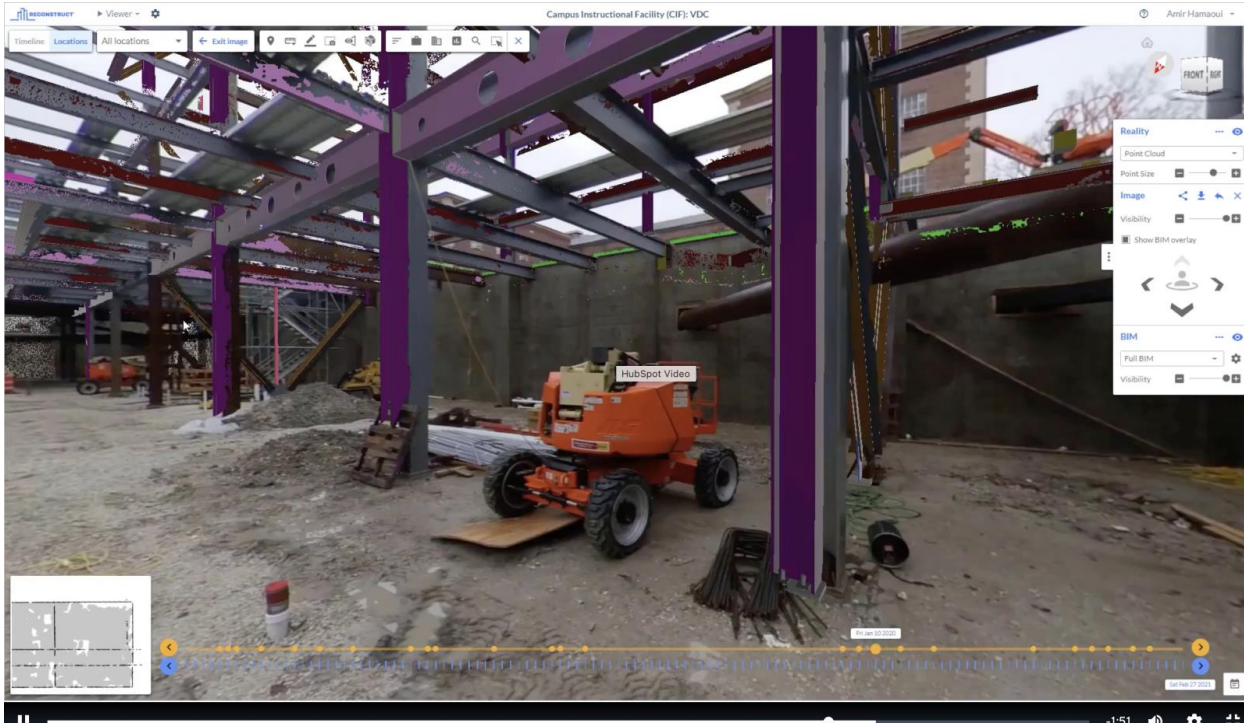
3D BIM Overlay (Reconstructinc.com)
